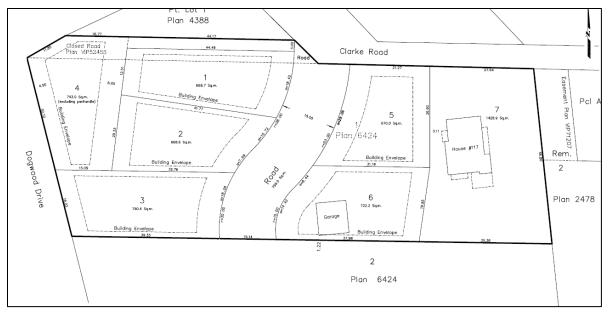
Proposed subdivision for 117 Clarke Rd., which is the property to the north of 341 Dogwood Drive
